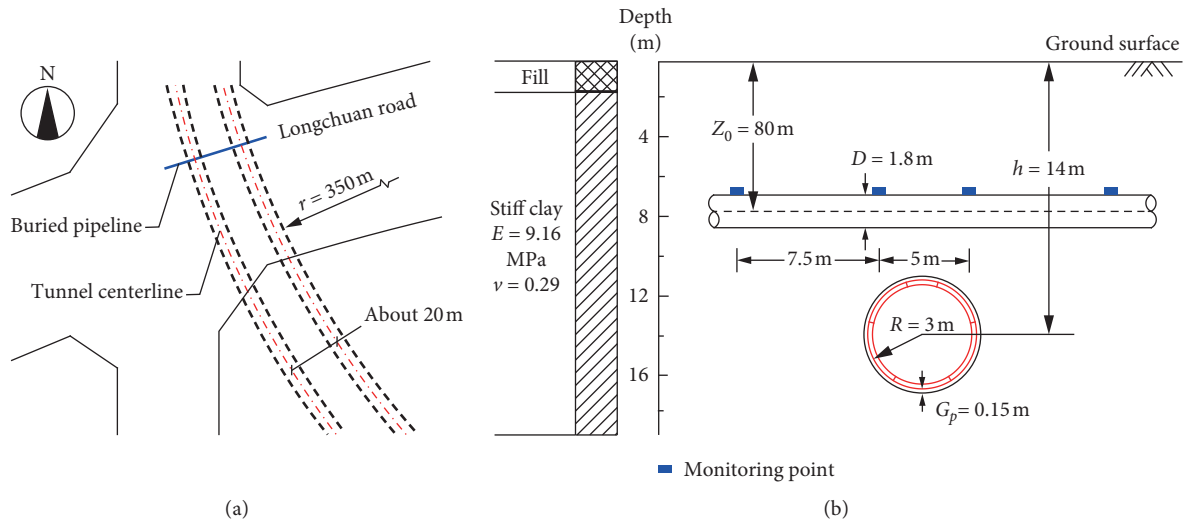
The cross-over relationship between the tunnel and pipeline and the placement of measuring points: (a) plan view; (b) section view and points arrangement.
